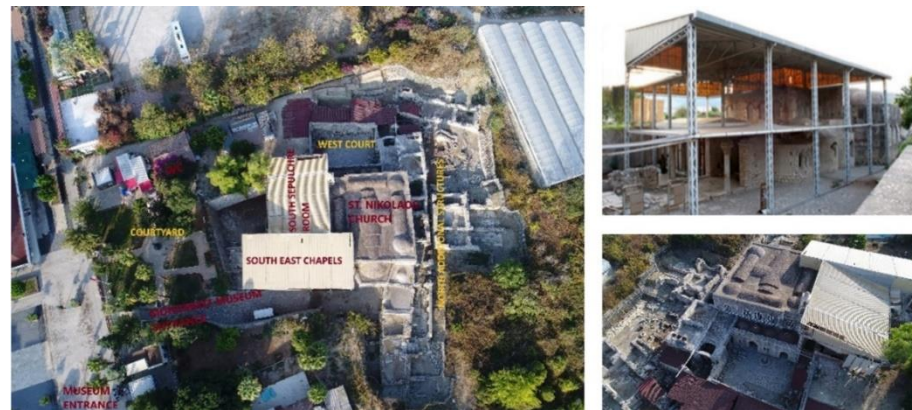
The church and its surrounding remains, the south and west facades (AMoCT-PR-4).
